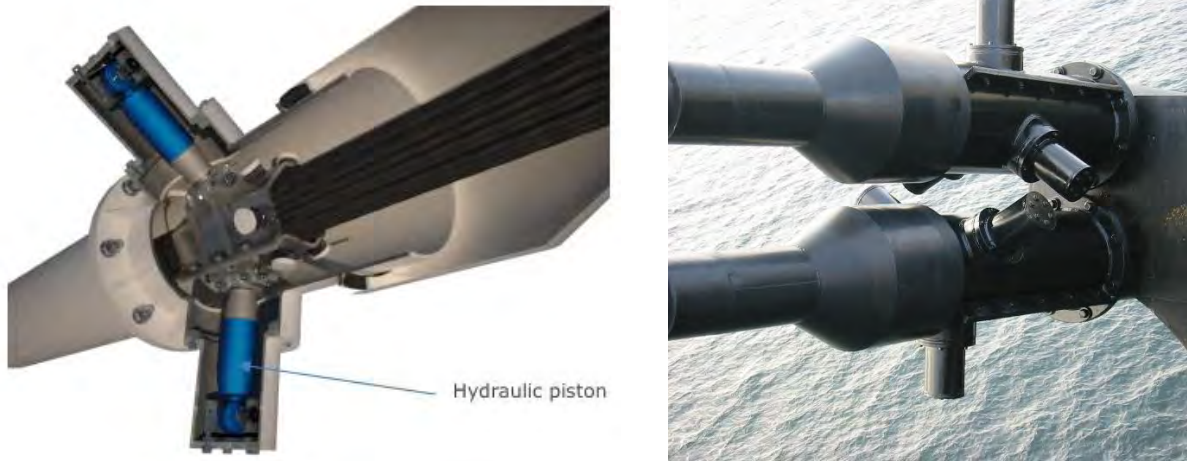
Hydraulic stay cable damper (Freyssinet IRD type). Cross section view (left). External view twin stay cables, Øresundsbron [right].
